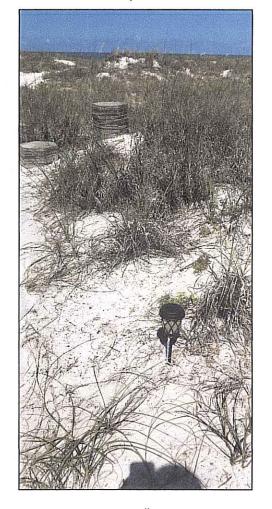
METAL POST (SEE SHEET 2 OF 7)
